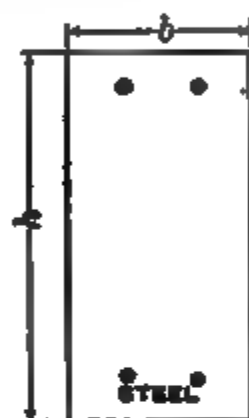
Resisting Forces with Steel in Top and Bottom of Beam. (See p. 563.)
